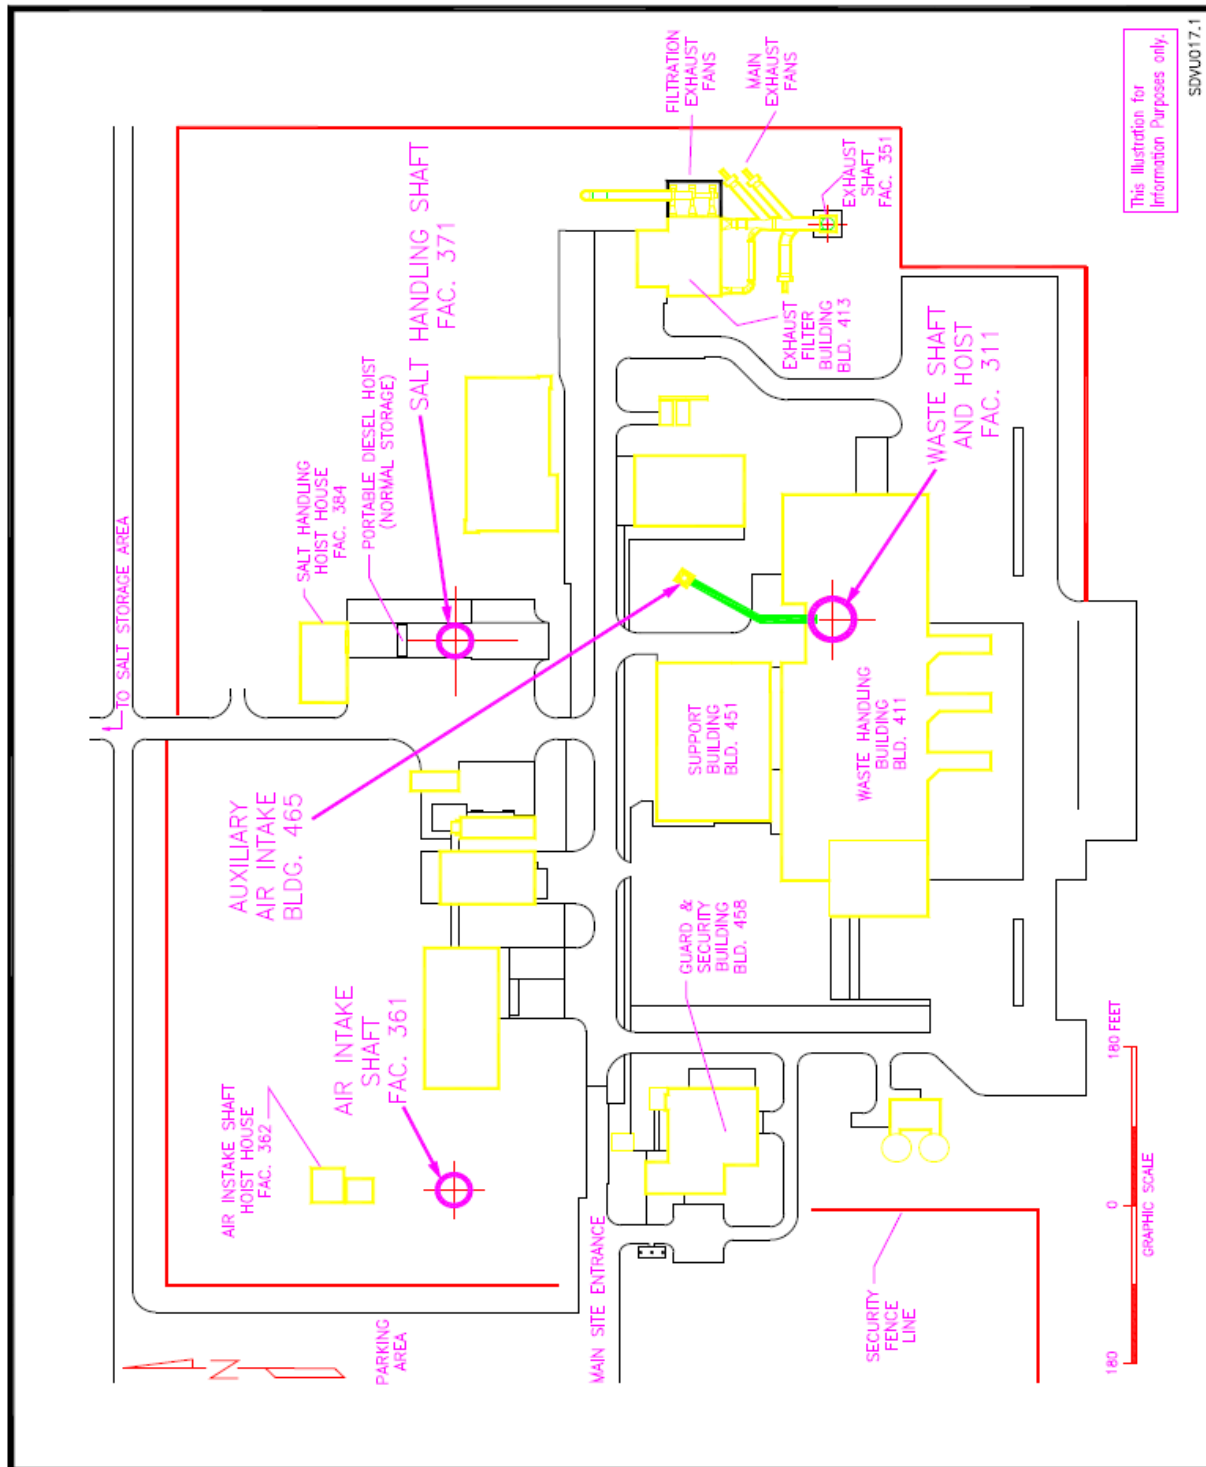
WIPP Surface Plot Plan – VU00 Surface Facilities
